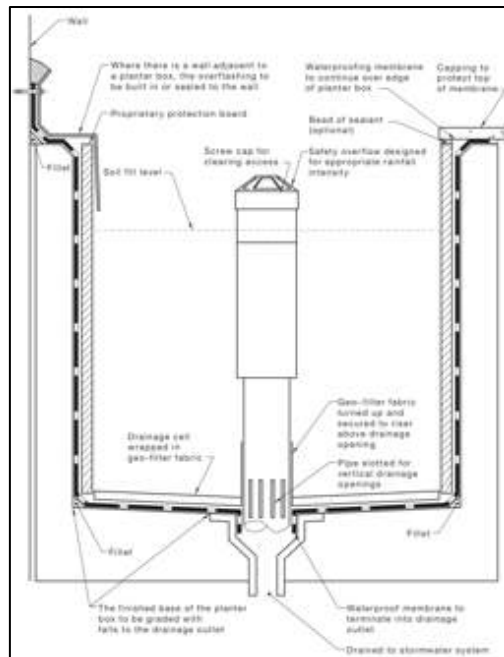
Typical Planterbox Construction extracted from AS 4654-2012
